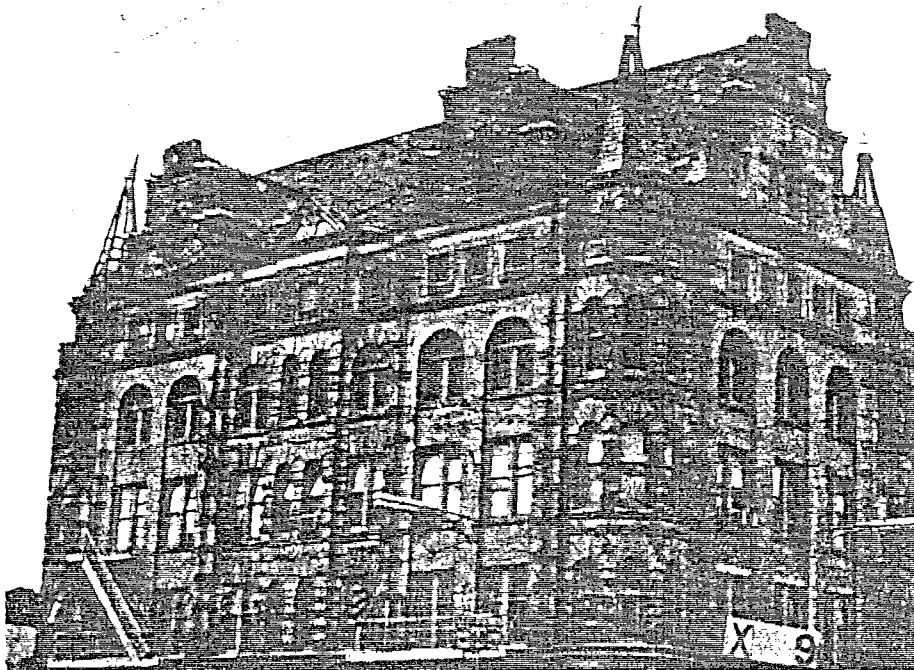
COMMERCIAL BUILDING: AN OLD FIVE STORY OFFICE BUILDING. Damage was restricted to the roof and to window glass.
